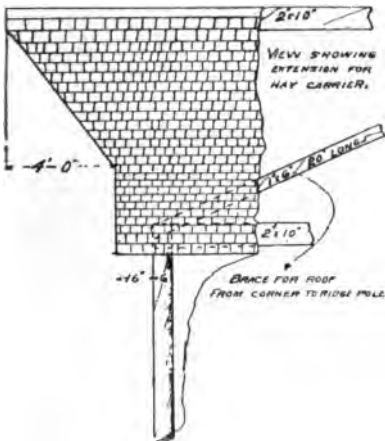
Section of roof of hay barn, showing extension for hay-carrier track and plan for bracing roof.—[Courtesy Kansas Experiment Station.]
